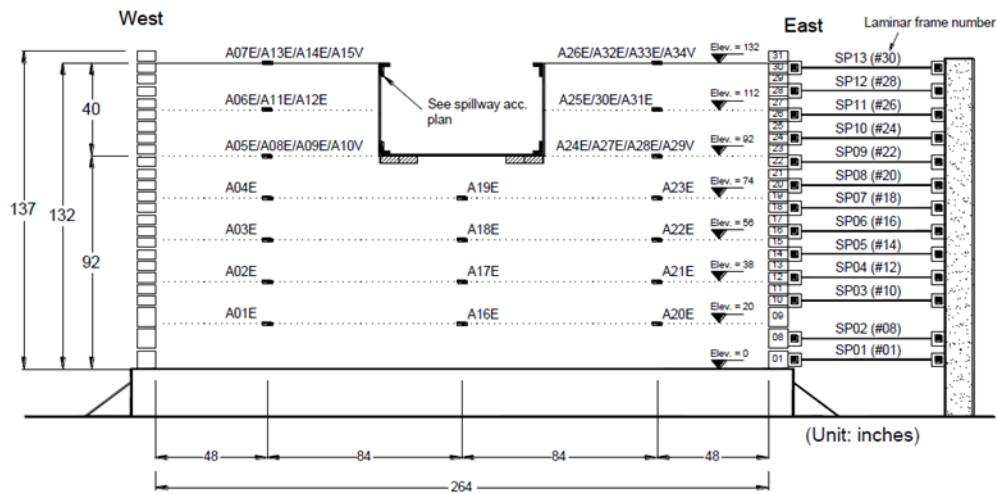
Instrumentation layout of accelerometer and string potentiometer
